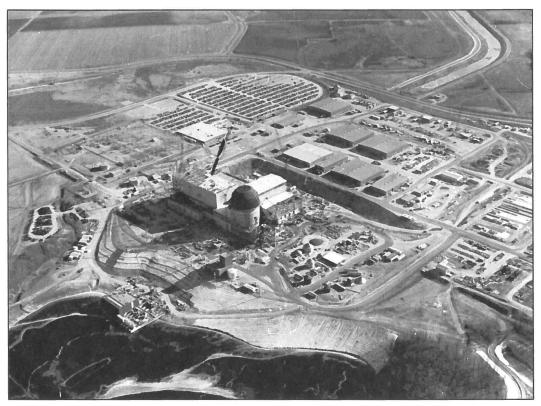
Construction Photograph of CPS Looking East, 1980
